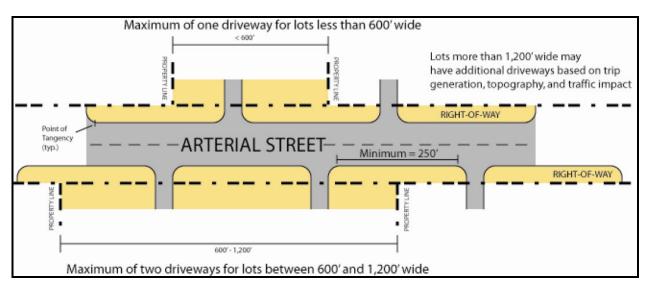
(3)a - Arterial Street Driveway Spacing Criteria
